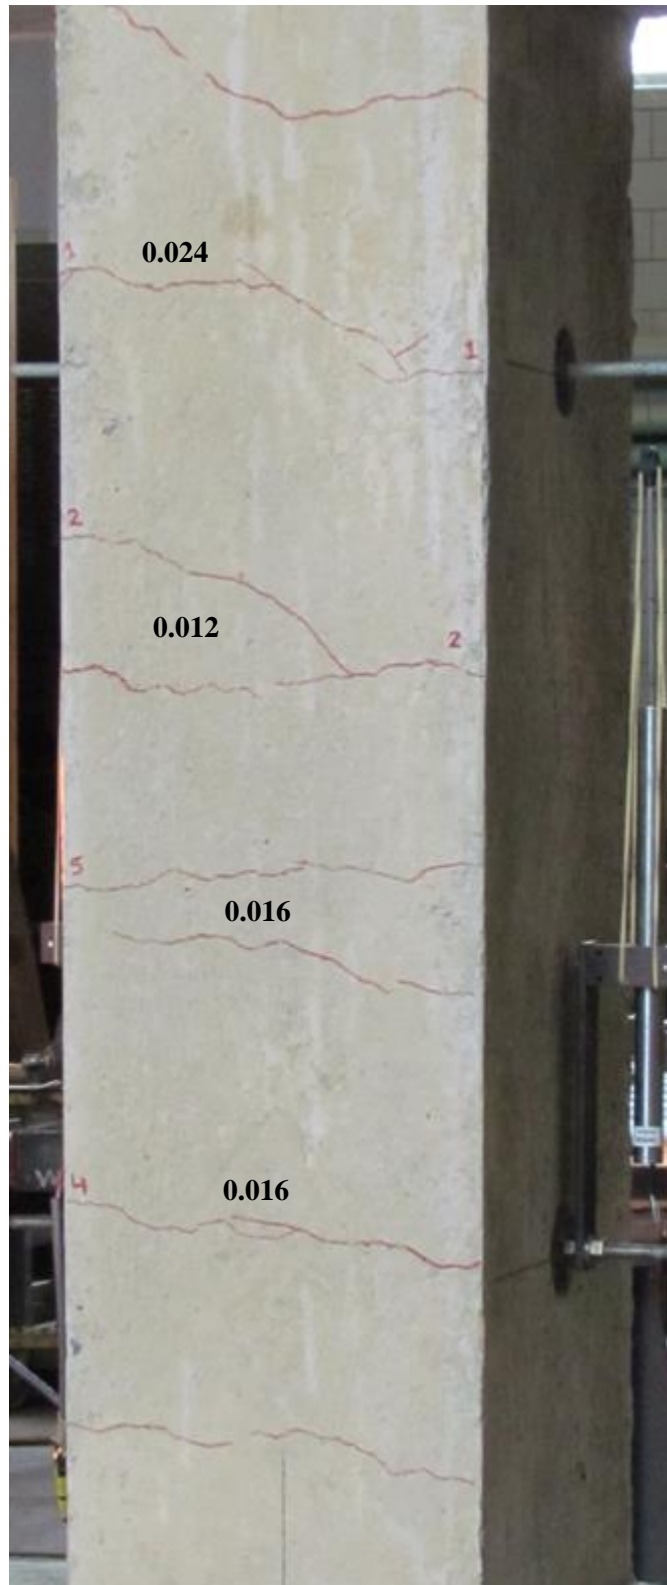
Cracks on west face of TS02 at Load Step 17
